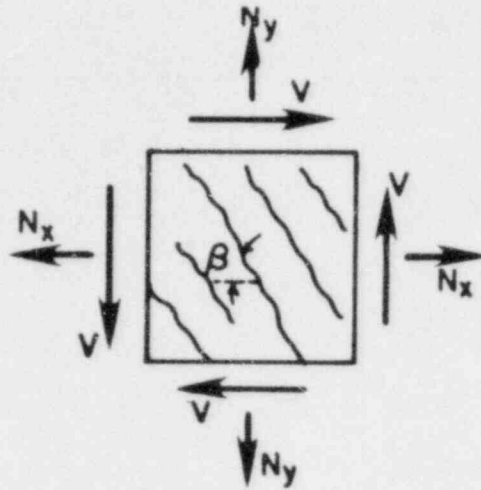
Reinforced concrete shell element subjected to membrane forces (Ref. 34).
